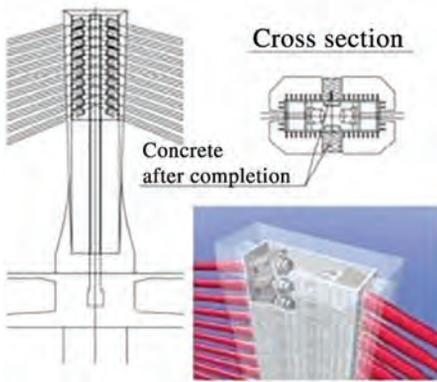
Composite anchorage at pylon (Shin-Meisei Bridge)<sup>55</sup>
